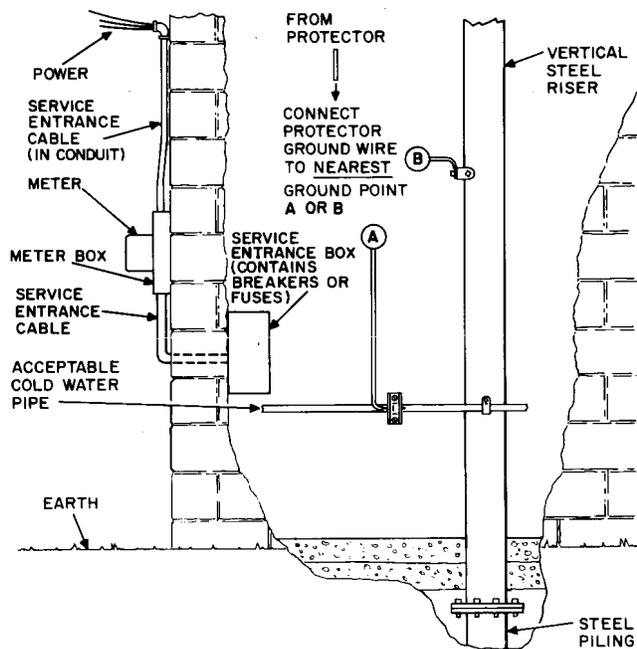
Acceptable Water System or Building Ground—Power Service Not Grounded
